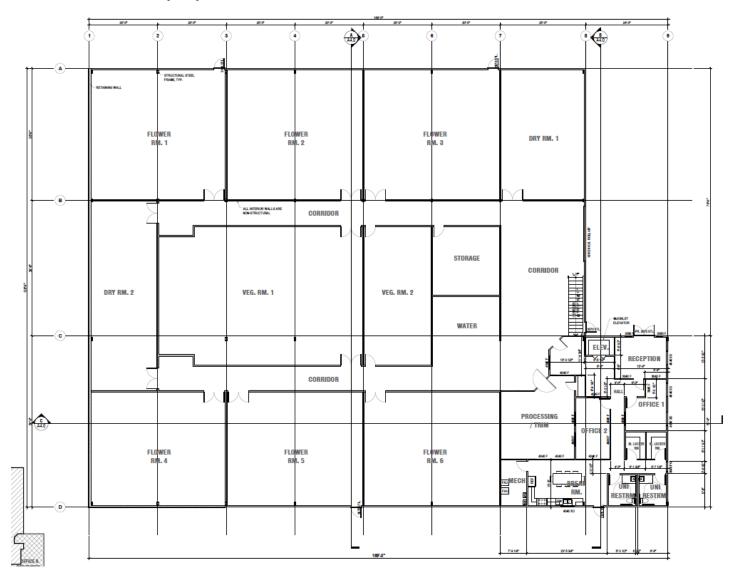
Cultivation Facility Layout: Second Floor
